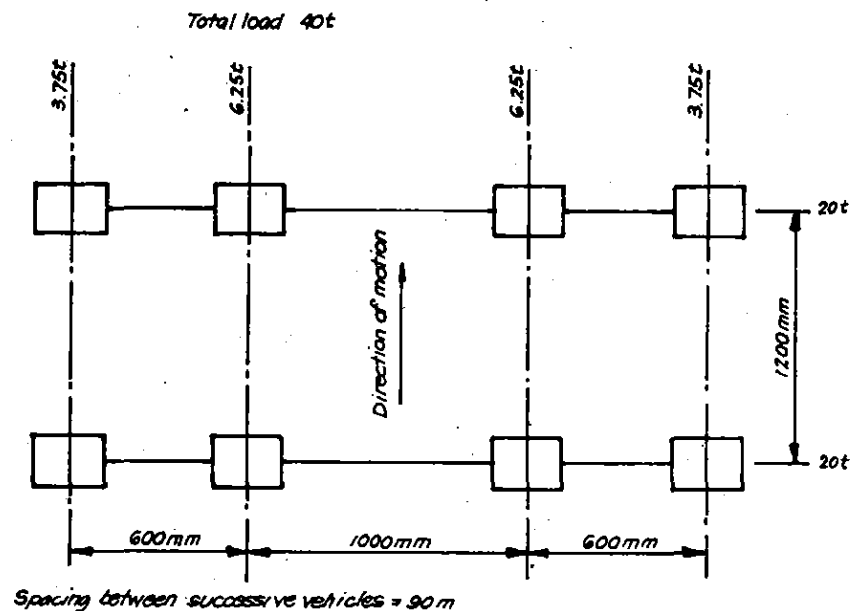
Plan view of the class AA 'Wheeled' vehicle
